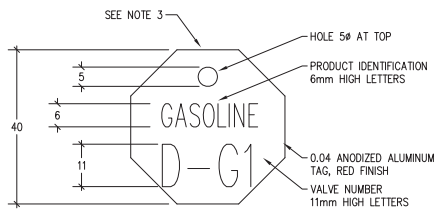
VALVE TAGS FOR GASOLINE SYSTEM
